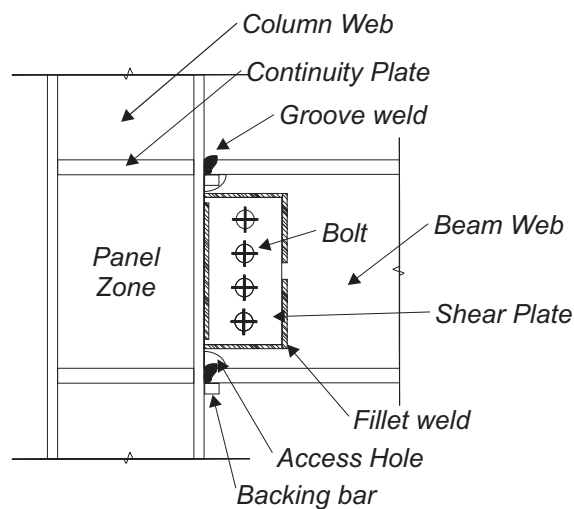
Typical pre-Northridge WFBW connection detail [143]
